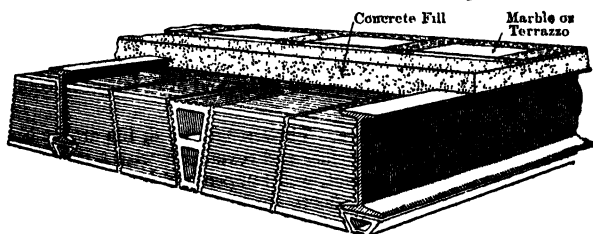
Section of End-construction Flat Arch with End-construction Skews and with Marble or Terrazzo Finish, Illustrating Placing of Units and Methods of Making Concrete Fill
